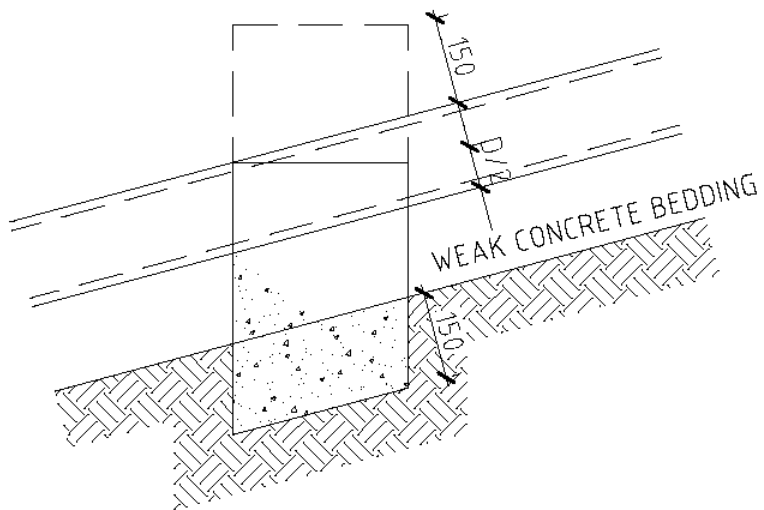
Domestic Drainage (Shallow Connection) Detail
